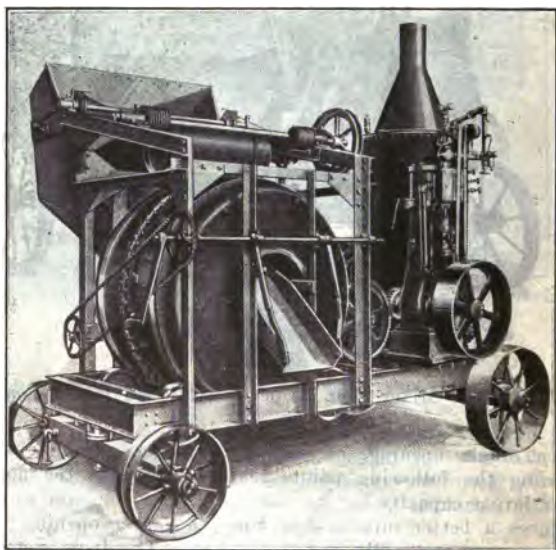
Mixer on Trucks Equipped with Steam Engine and Boiler, Power Loader and Pressure Water Tank.
